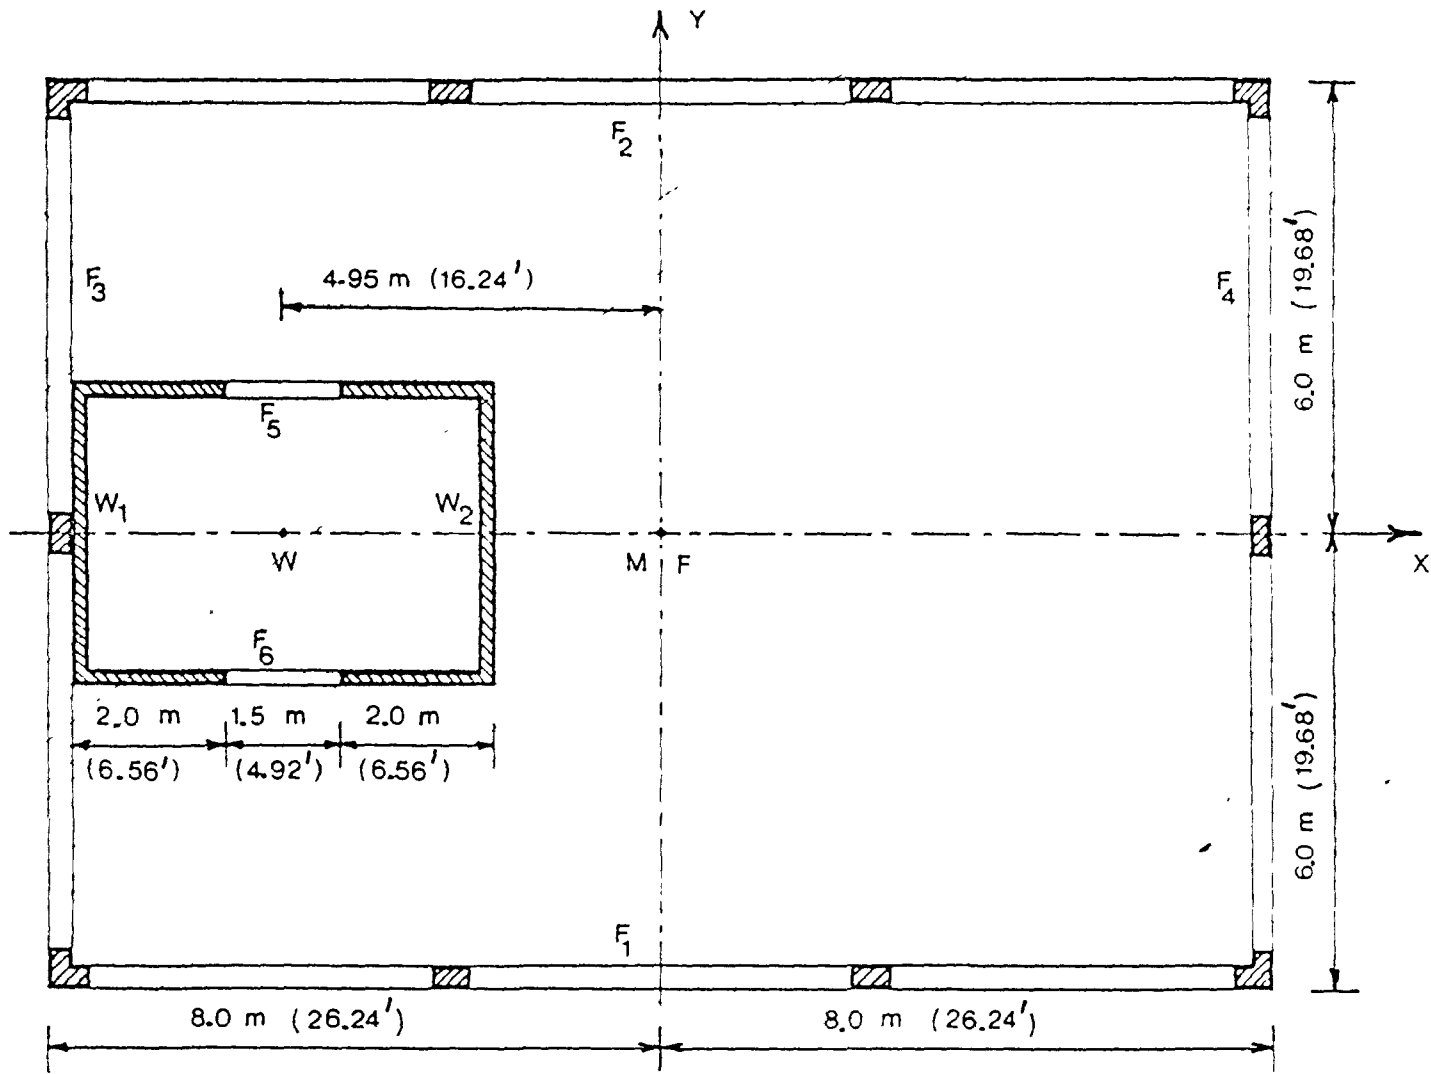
FLOOR PLAN FOR EXAMPLE STRUCTURE I
